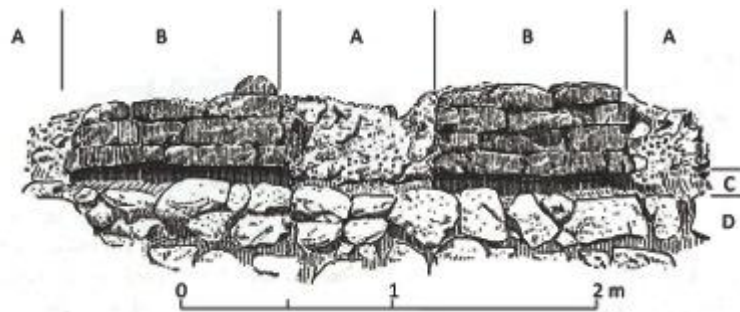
Wall ruins in Büyükkale A: infill and vertical wooden lacing course; B: mudbrick wall; C: horizontal wooden lacing course D: stone foundation (Naumann, 1991)
